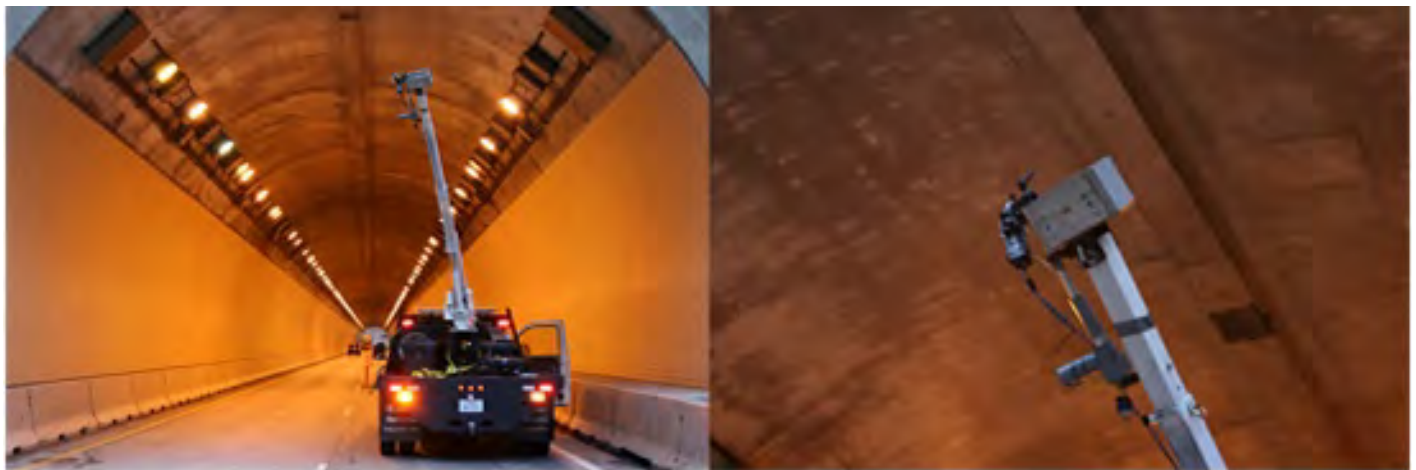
Thermal video camera mounting used in U.S. tunnel surveys.
